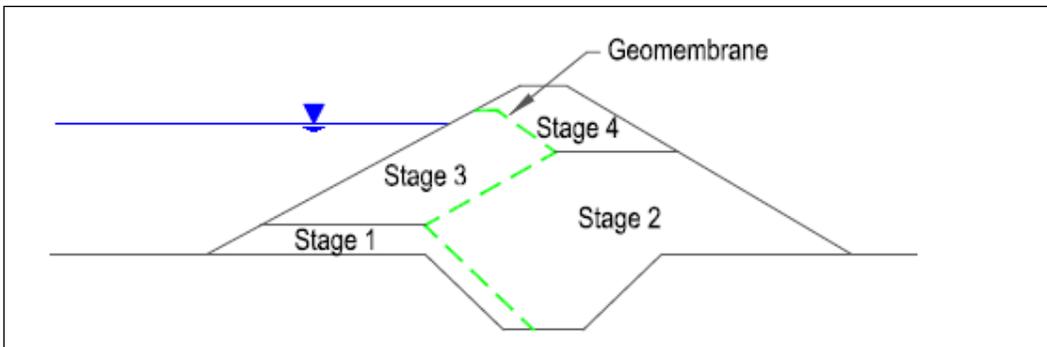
Seepage barrier using geomembrane in staged construction.
